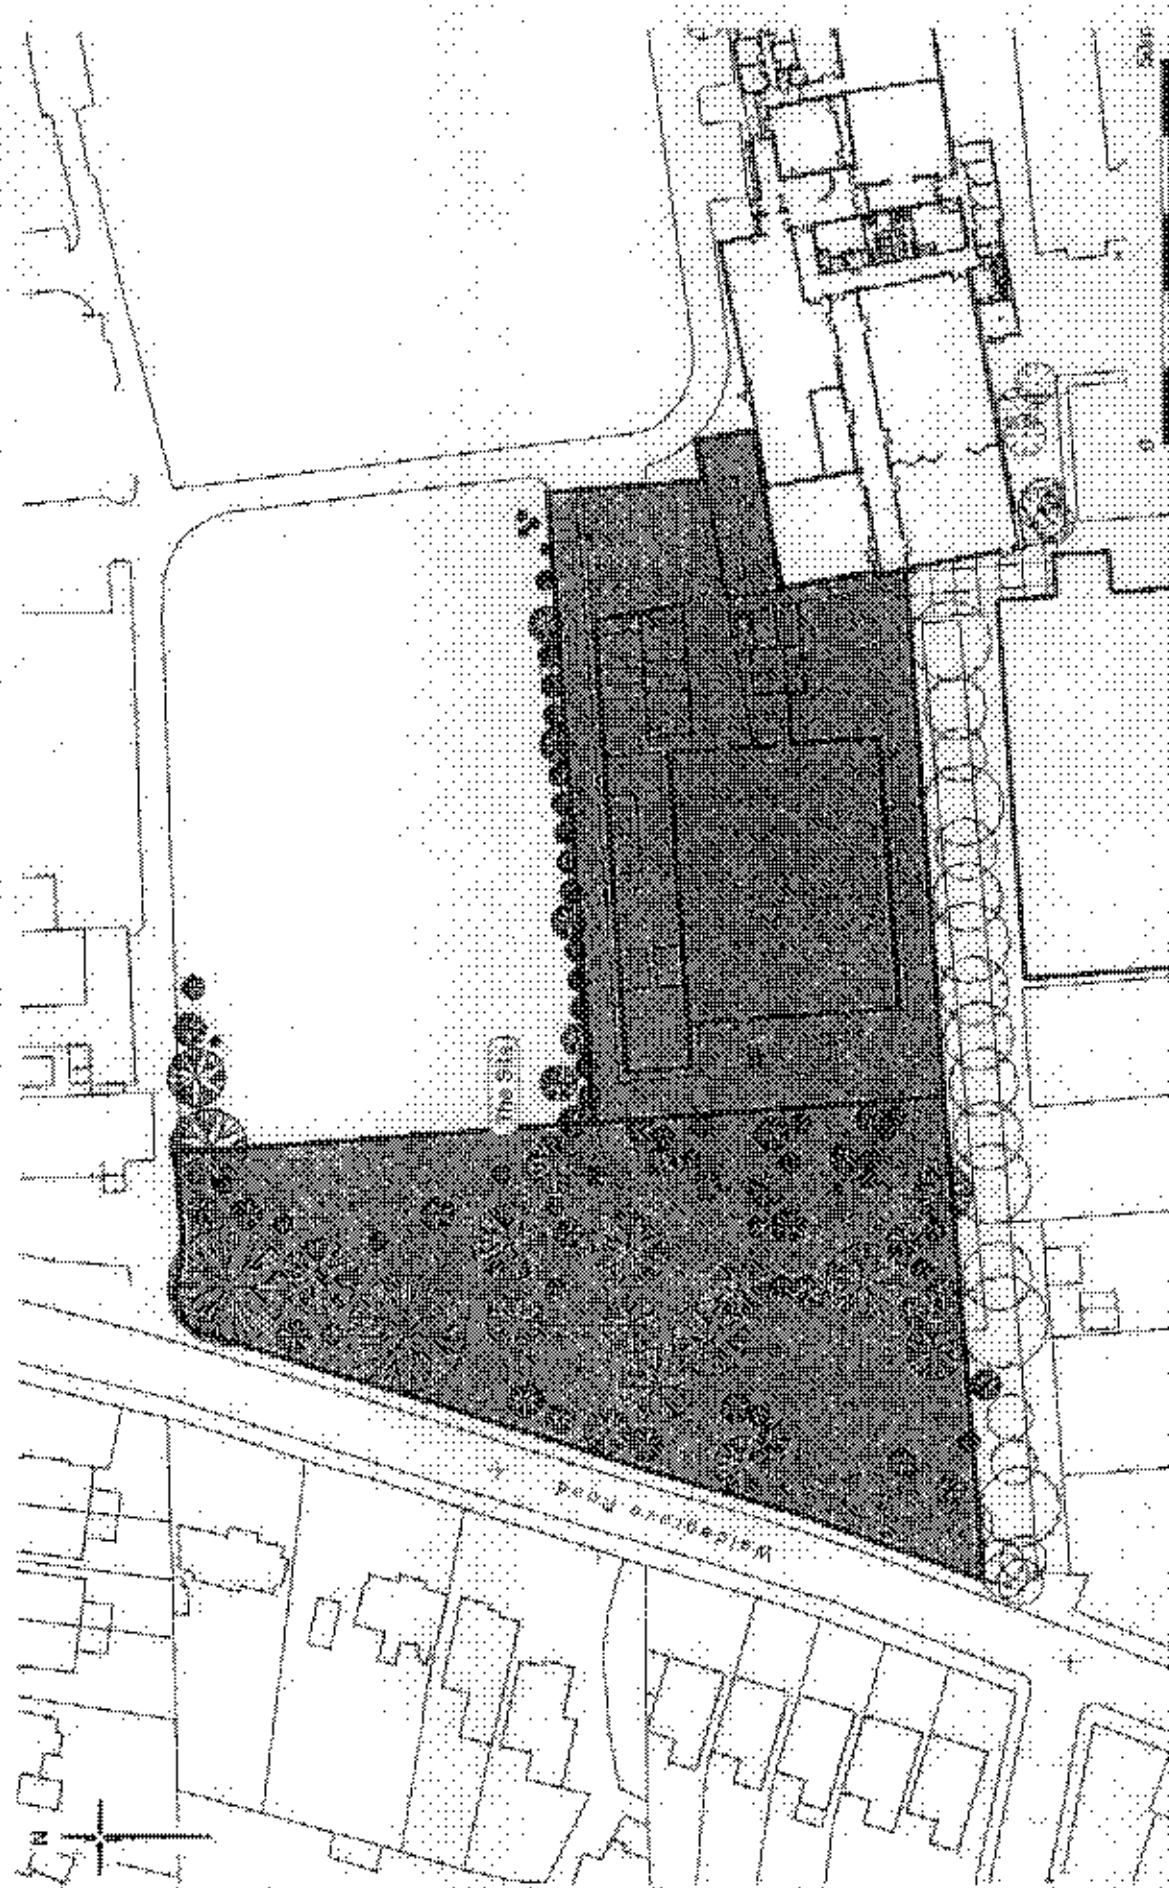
St Mary's College proposed development [adapted] from Kington Street Studio Architecture dwg no. 05/02, September 16
